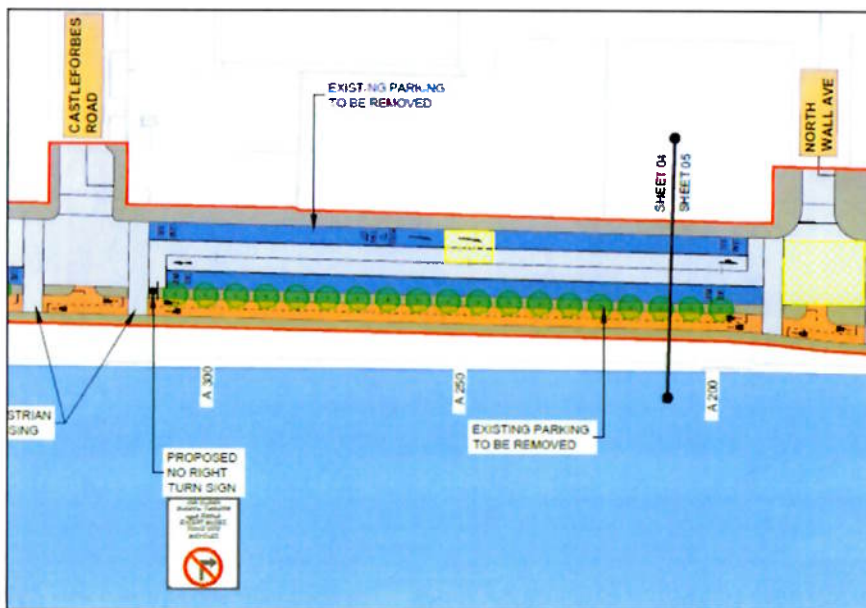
Extract from General Arrangement Drawing Sheet 4 Part 2 North
